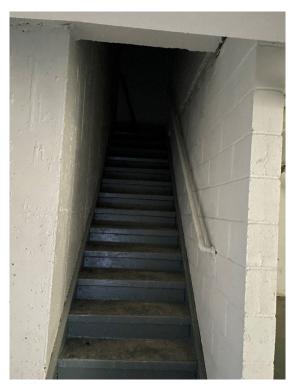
View of one of the basement staircases leading to the first floor; concrete wall partition separates the staircase from upstairs office space.
